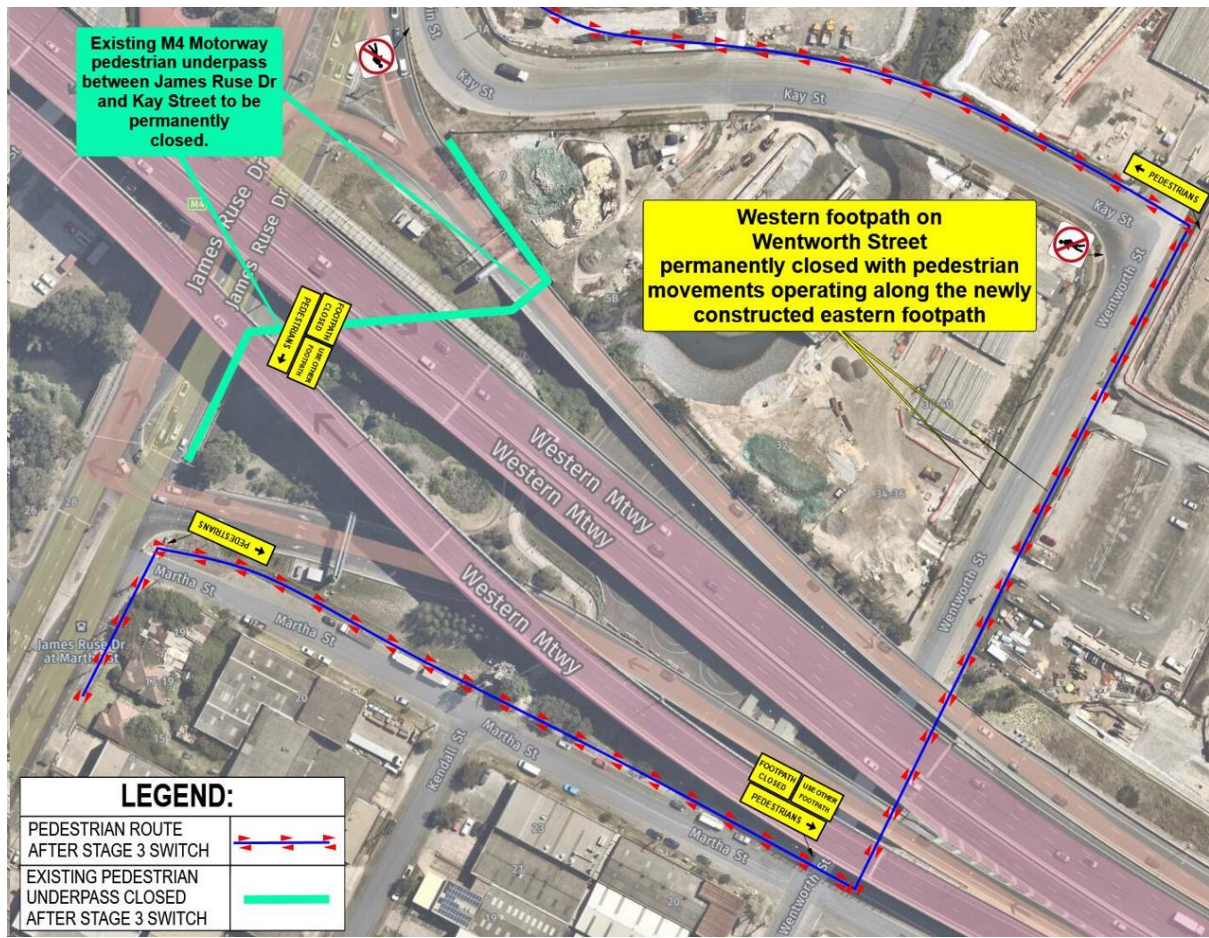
Wentworth St and M4 Underpass Footpath Diversions Overview
